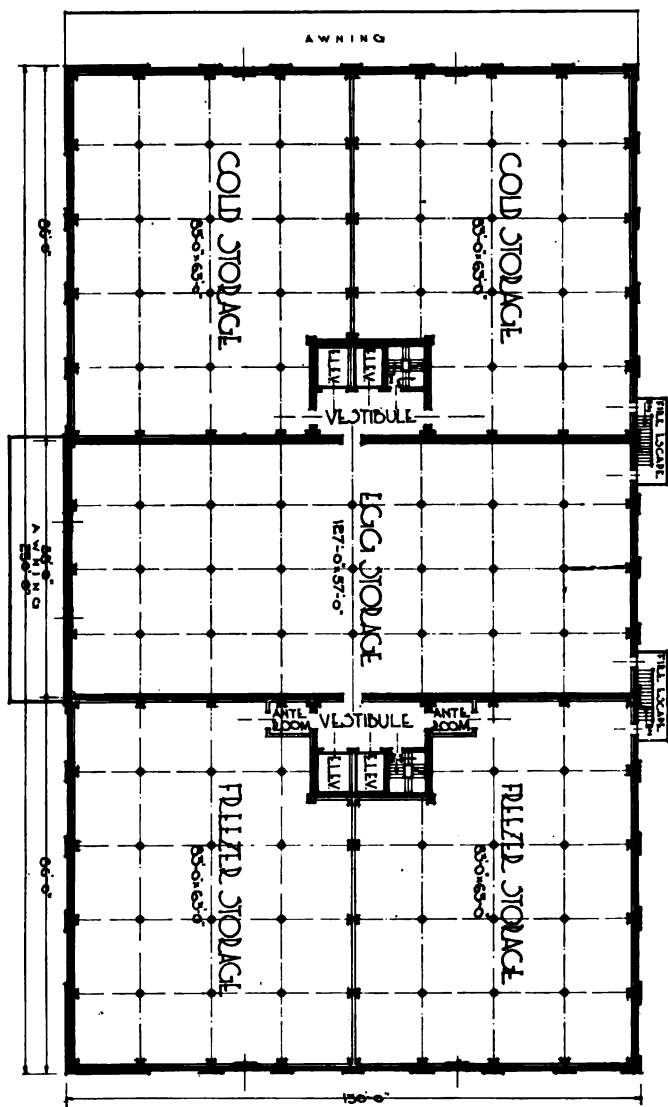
TYPICAL FLOOR PLAN—MERCHANTS COLD STORAGE & WAREHOUSE CO.
